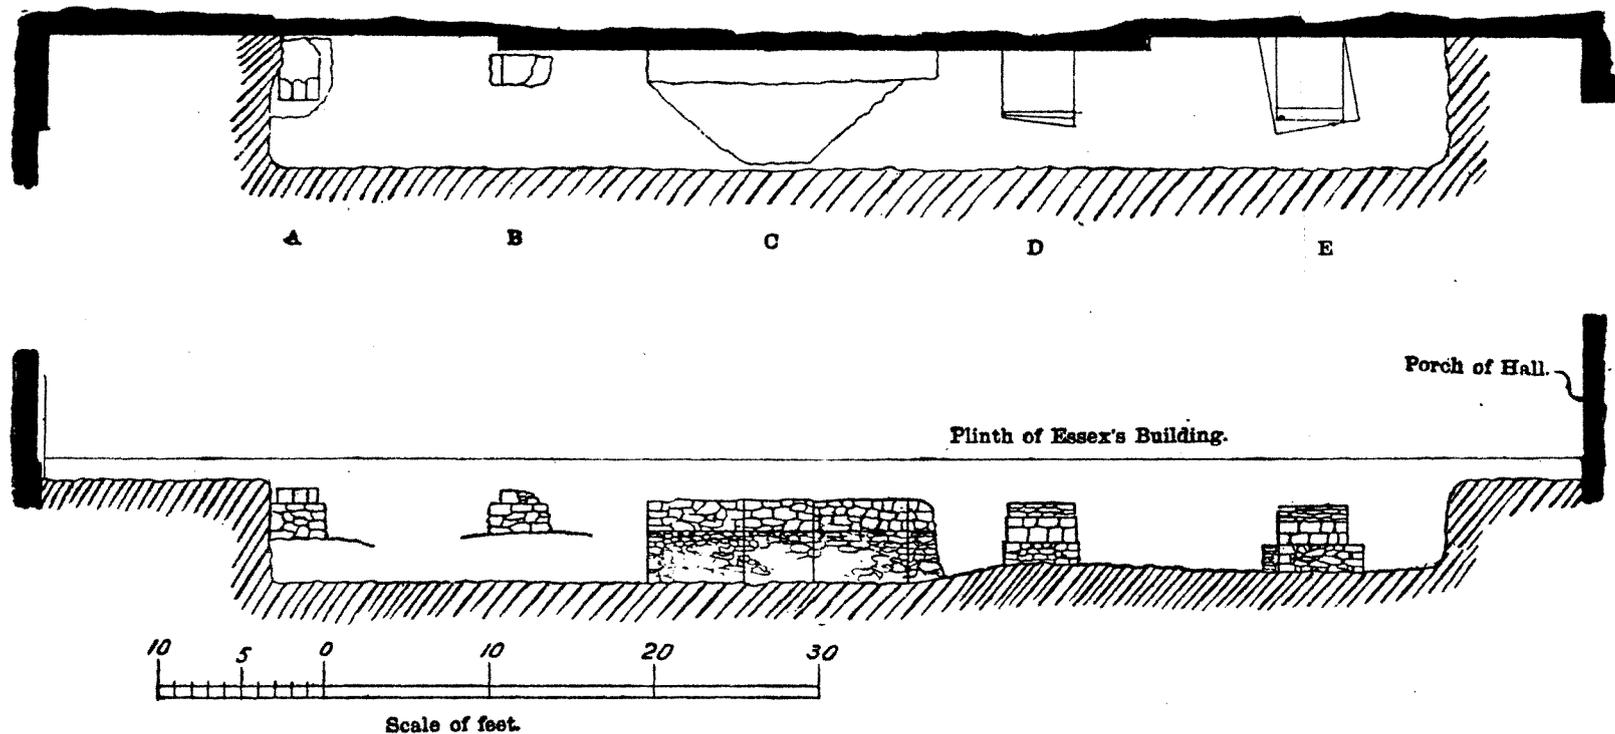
Ground plan and elevation of the foundations of the oriel and buttresses of the hall of Michael House.
